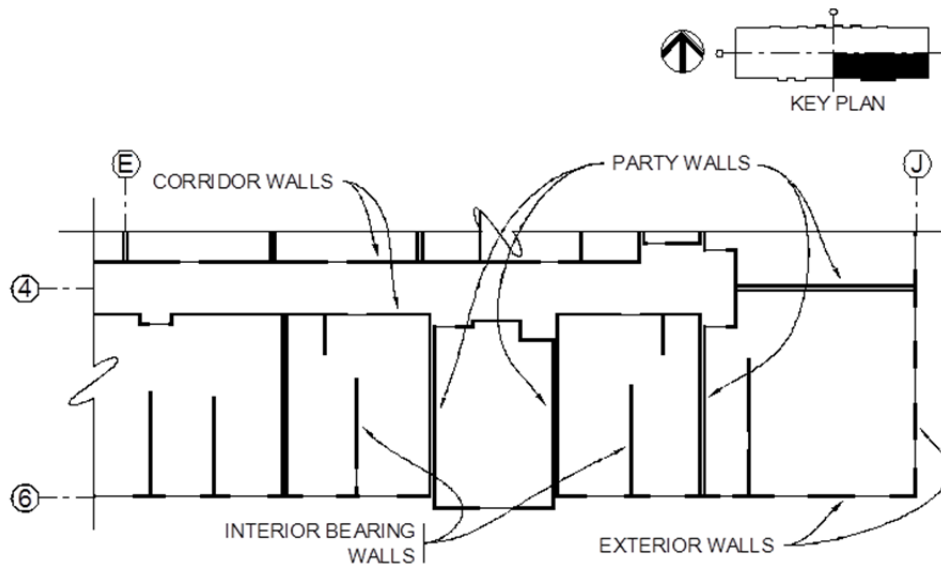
Plan of shear walls (southeast corner) for wind design.
